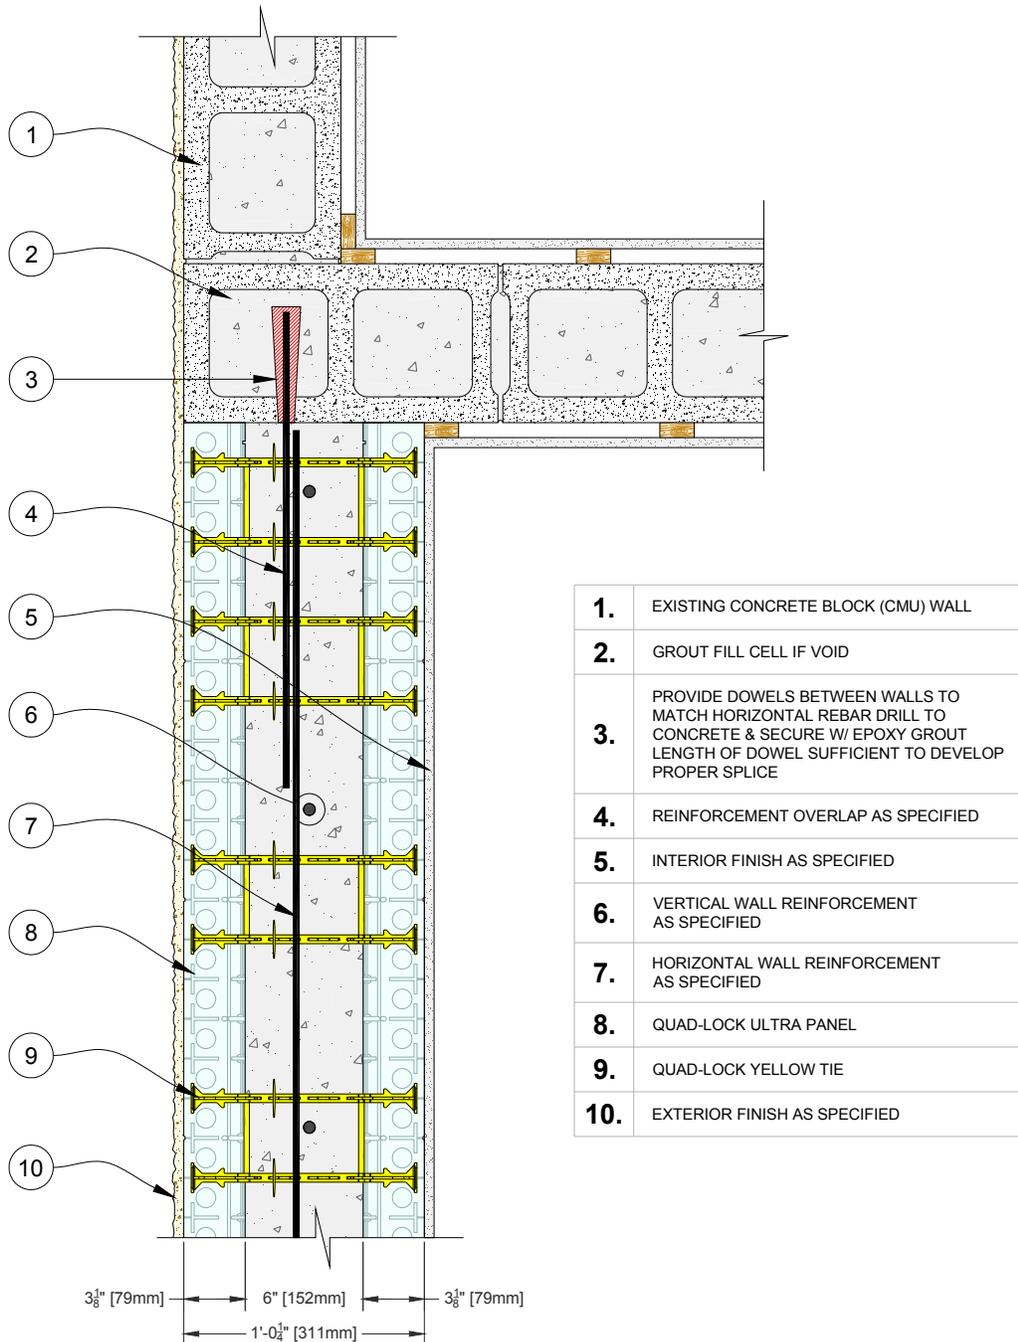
Typical Connection to Existing Concrete Wall (Plan View)
